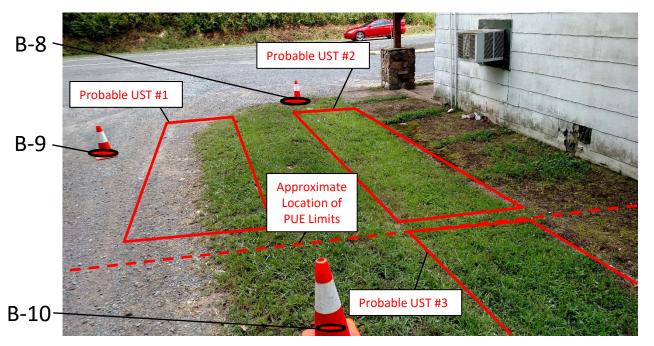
Boring locations B-8, B-9, B-10, and two probable USTs located just northwest of the gas station/restaurant building, facing east.
